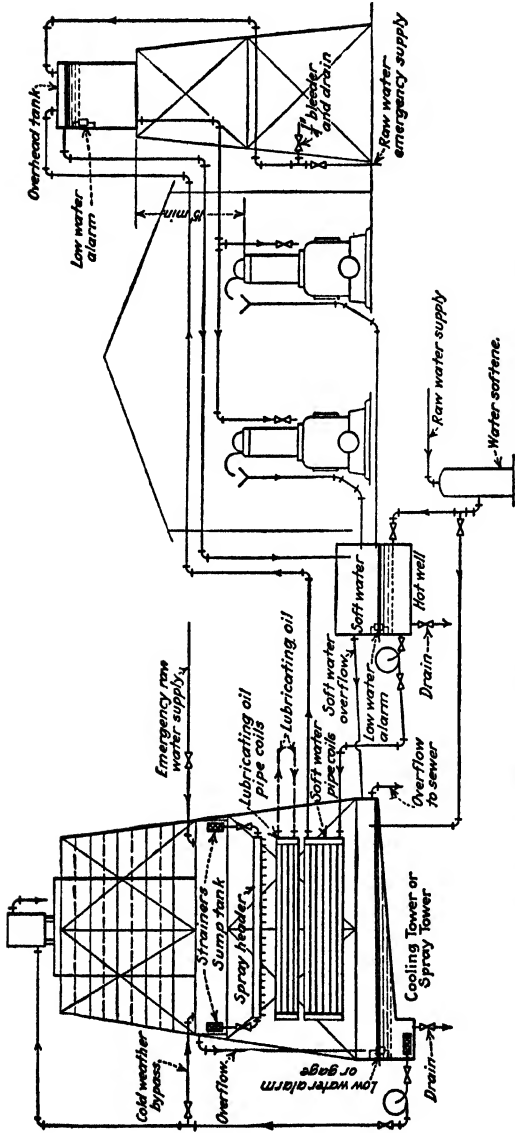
Cooling-water system with cooling tower and pipe-coil heat exchanger.
